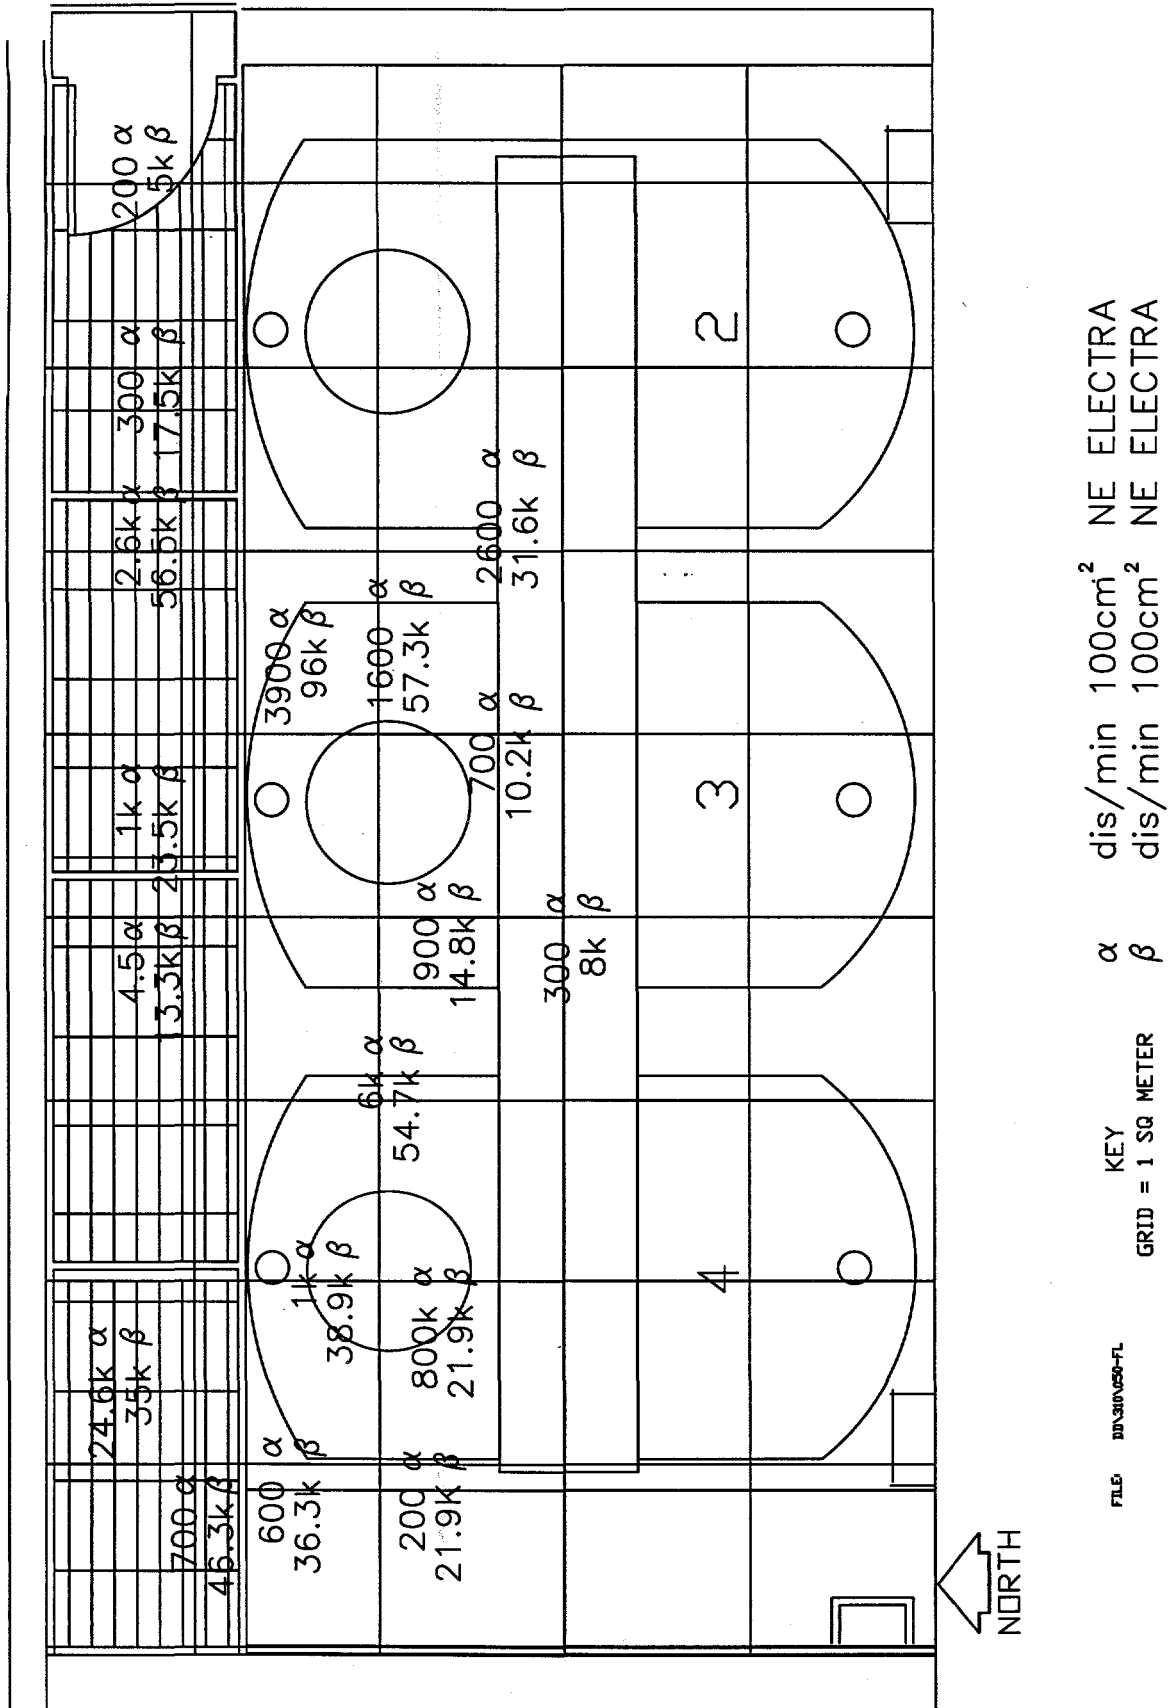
Building 310 Retention Tanks; Room 050 Floor
